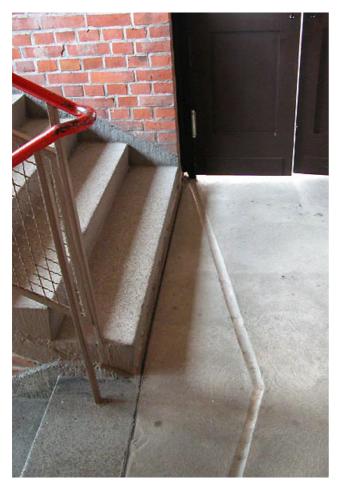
Drainage channel in stairwell, photo 2004, Bauhaus Dessau Foundation, Bettina Lietz
